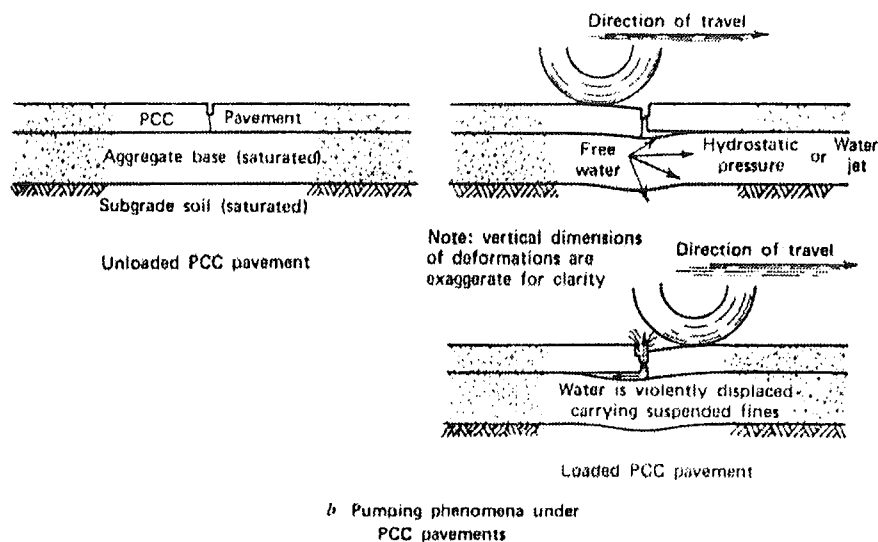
Mechanism of pumping which affects faulting and spalling (FHWA 1973b).
